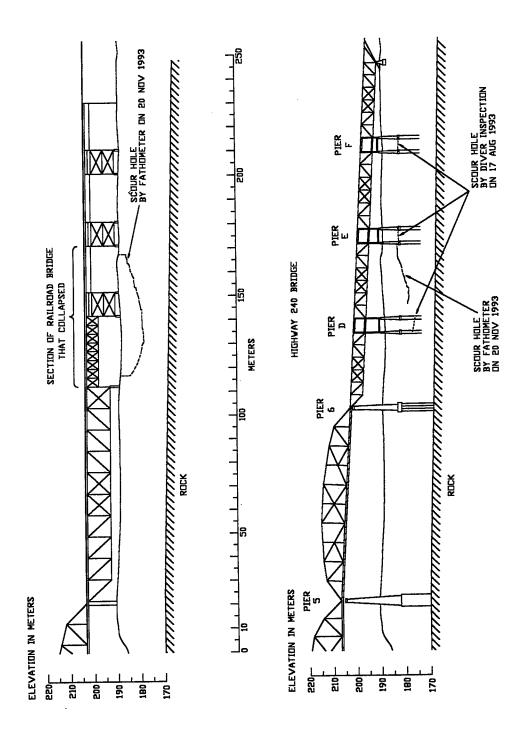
Downstream view of west floodplain section at railroad bridge and Missouri Highway 240 bridge, with sections of scour holes, near Glasgow, Missouri (bridge design courtesy of Missouri Highway and Transportation Department).
